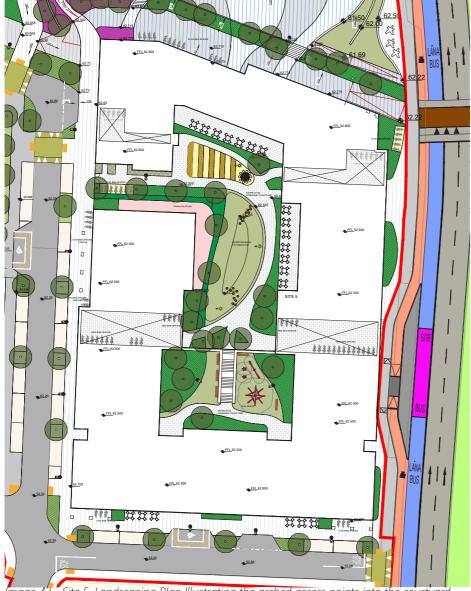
Site 5, Landscaping Plan Illustrating the arched access points into the courtyard area. The upper level of the courtyard is to the south accessed via an external flight of steps; this conceals plant, refuse and bicycle storage at ground floor level
